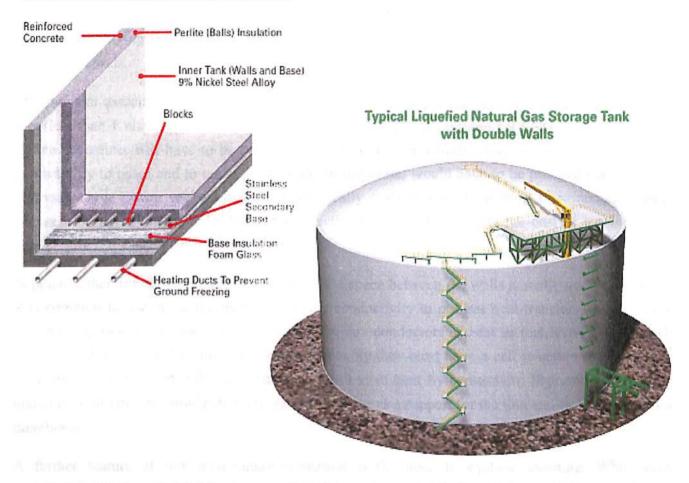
A typical LNG storage tank and the cross-sectional view of the LNG storage tank Source: Beyond Petroleum (bp), LNG Storage tanks
